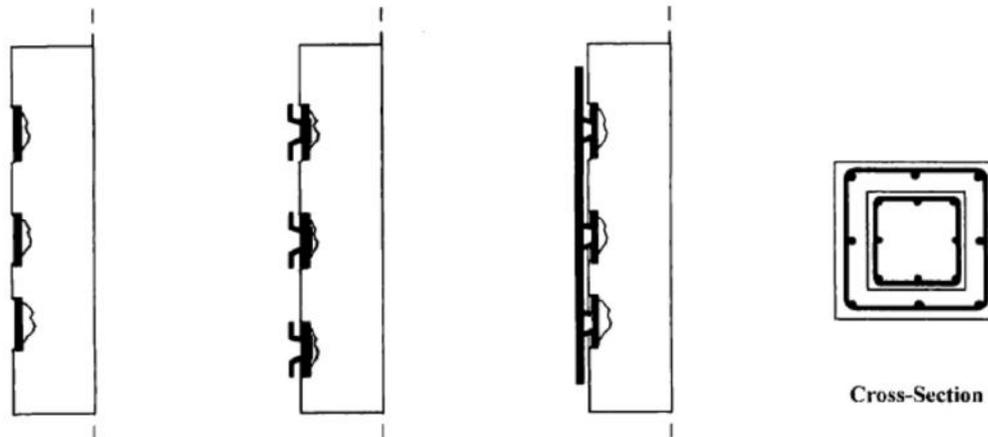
U-shaped steel rebar welded to existing and new corner bars are not recommended for RC jacketing (FIB, 2003).
